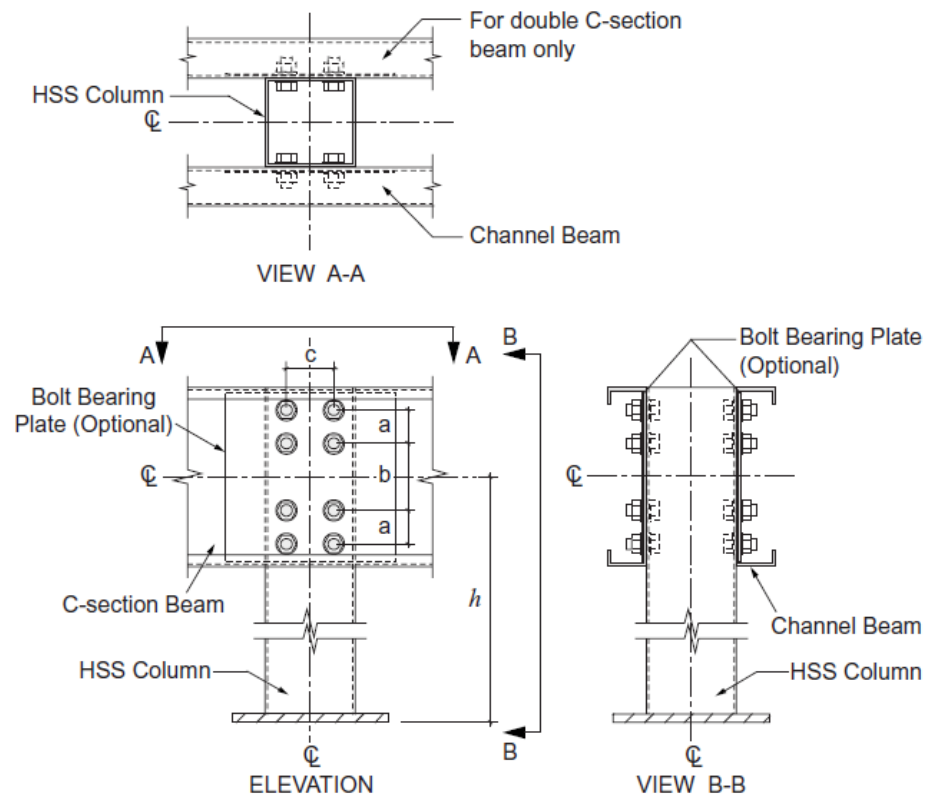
CONNECTION OF HSS COLUMNS AND DOUBLE CHANNEL BEAMS (UANG ET. AL, 2010)
